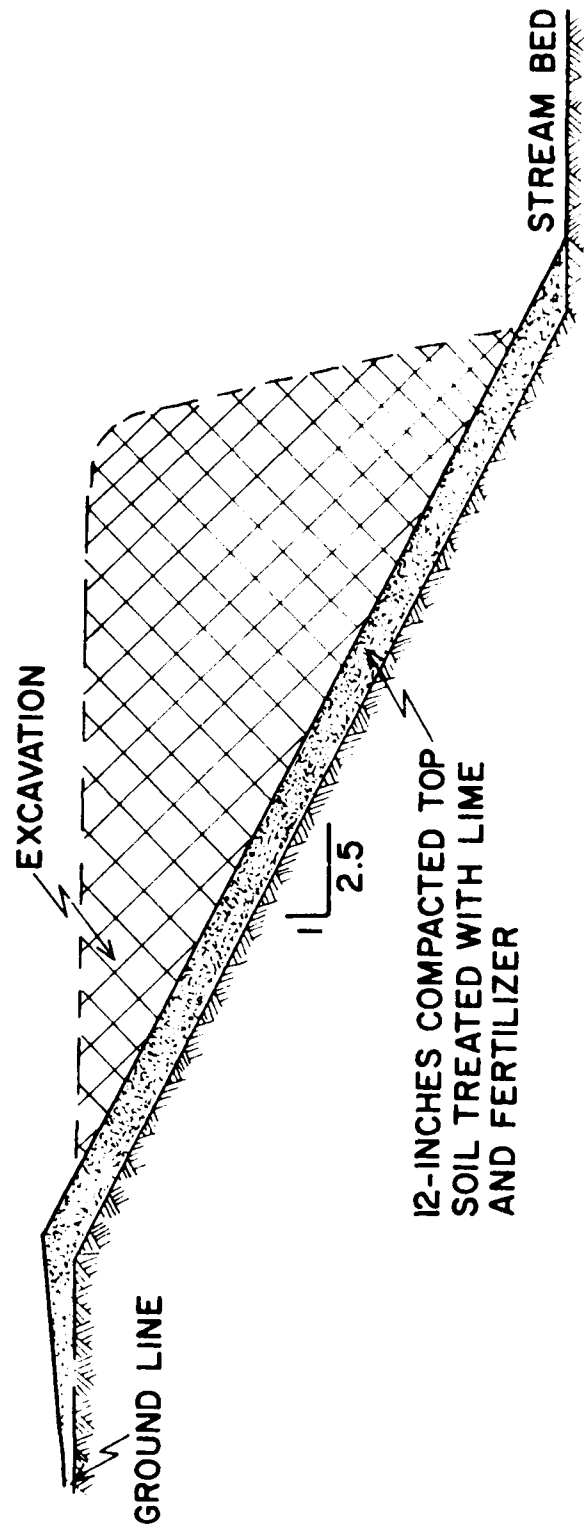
Johnson Creek Study Reach No. 3 - Typical Sloped Bank Without Structural Materials
